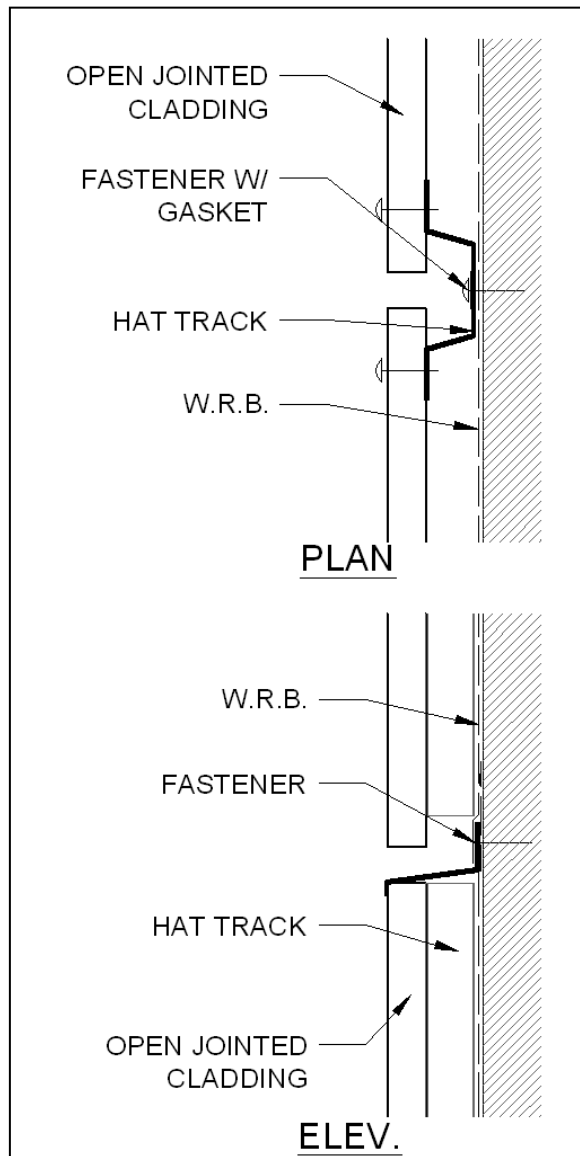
Example of Baffled Joint System with hat track at vertical, and through-wall flashing at vertical joints.
